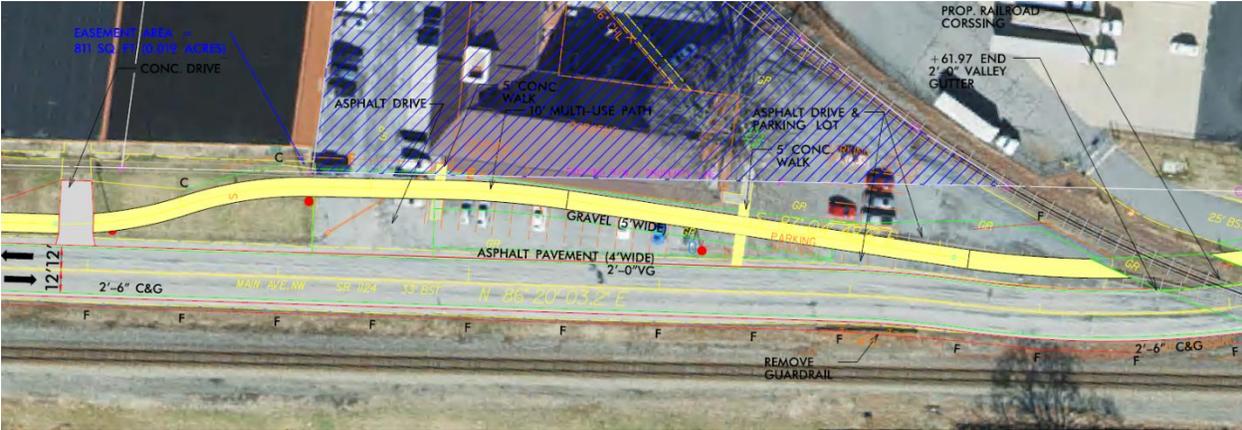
Applicant provided site plan. *The proposed trail (in yellow) will follow the path of the existing railroad spur.
